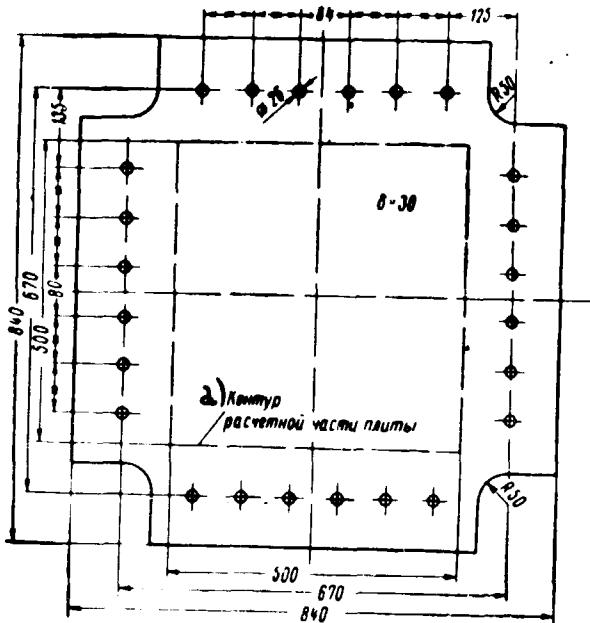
Sample for Testing Reinforced Concrete for Shear in Plate's Plane.
